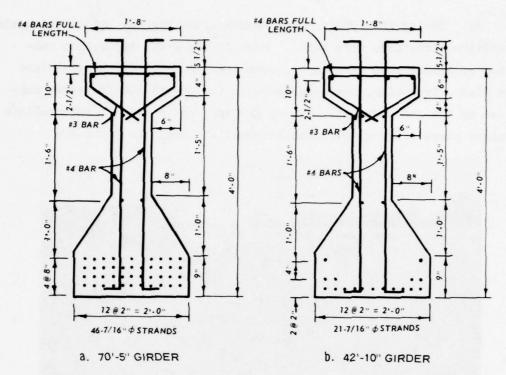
I-shaped girder cross sections and reinforcing (from Reference 20)
